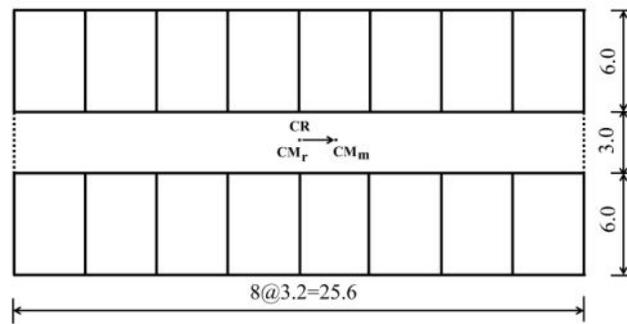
Plan of the considered building models (CR - centre of rigidity, CM_r- centre of mass of regular building, and CM_m - centre of mass of mass-eccentric building, longer and shorter dimensions are considered along x and y directions, respectively).
